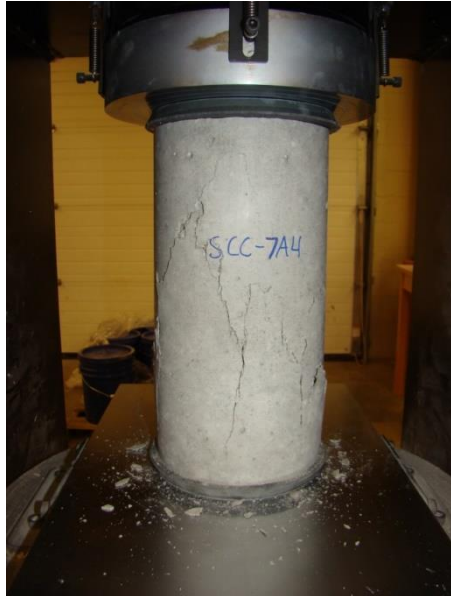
SCC Standard Cylinder Specimen at Failure
